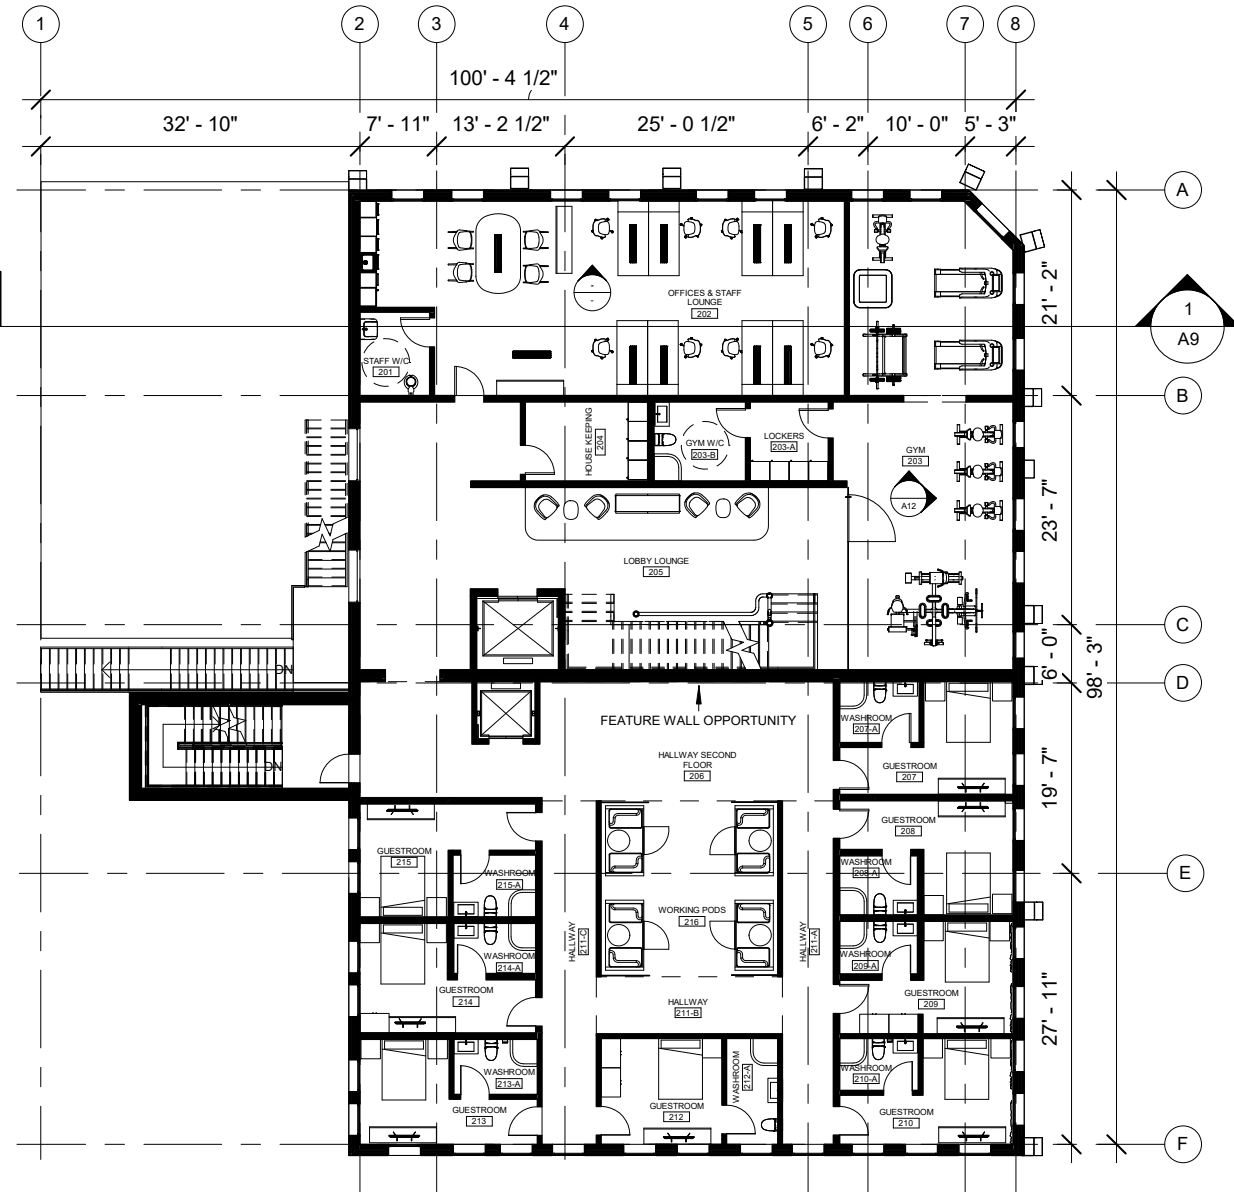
Second Floor Plan contains guestrooms, gym with offices
